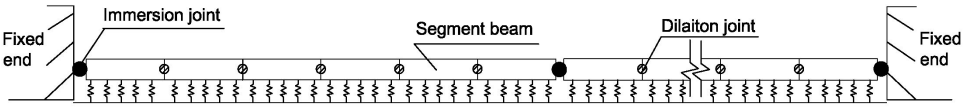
Longitudinal beam on elastic foundation model of immersed tunnel
